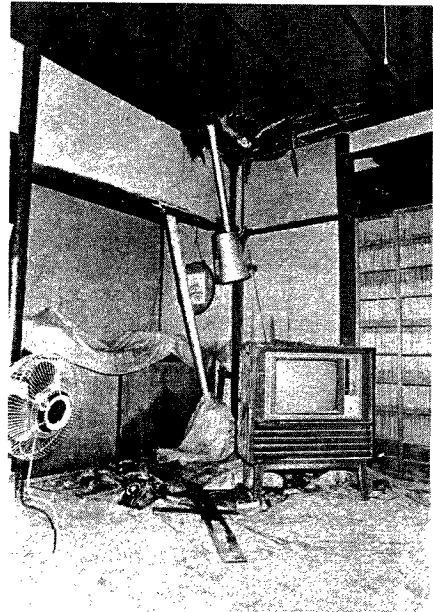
Tentframe breaking the roof and ceiling of a house, KYOTO (by the courtesy of the Kyoto Shimbun).
